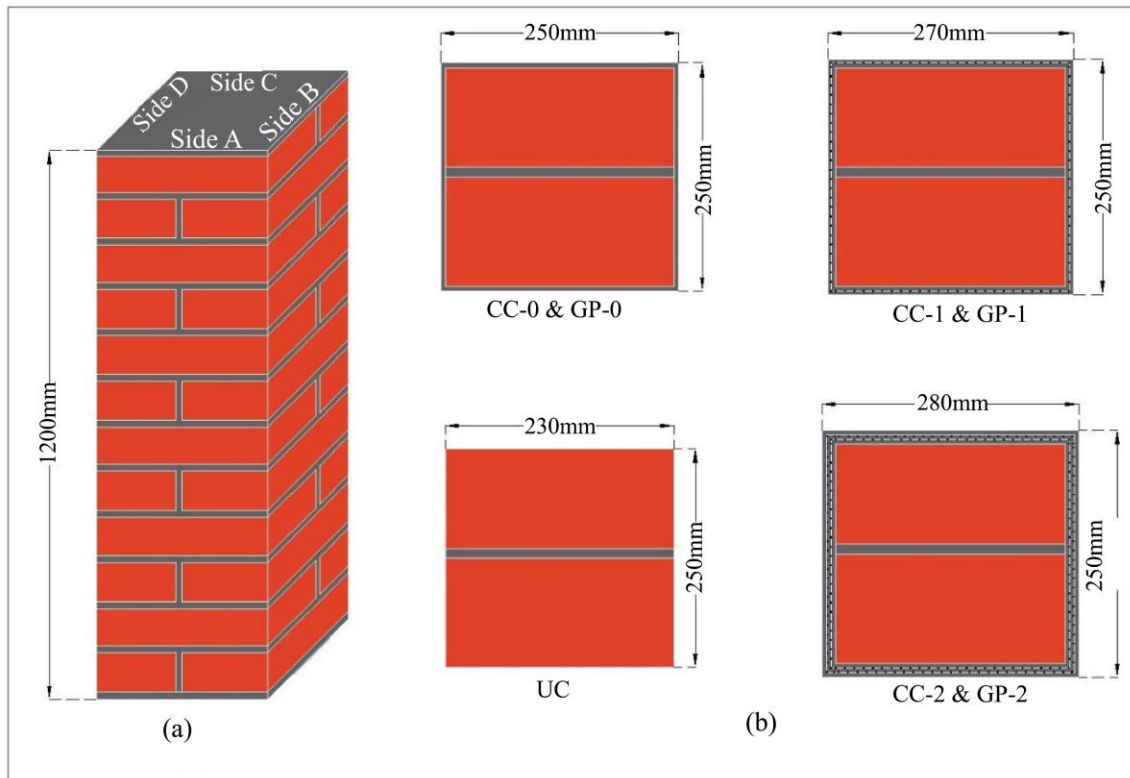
Geometry of the masonry column (a) Elevation, AND (b) Cross-section.
